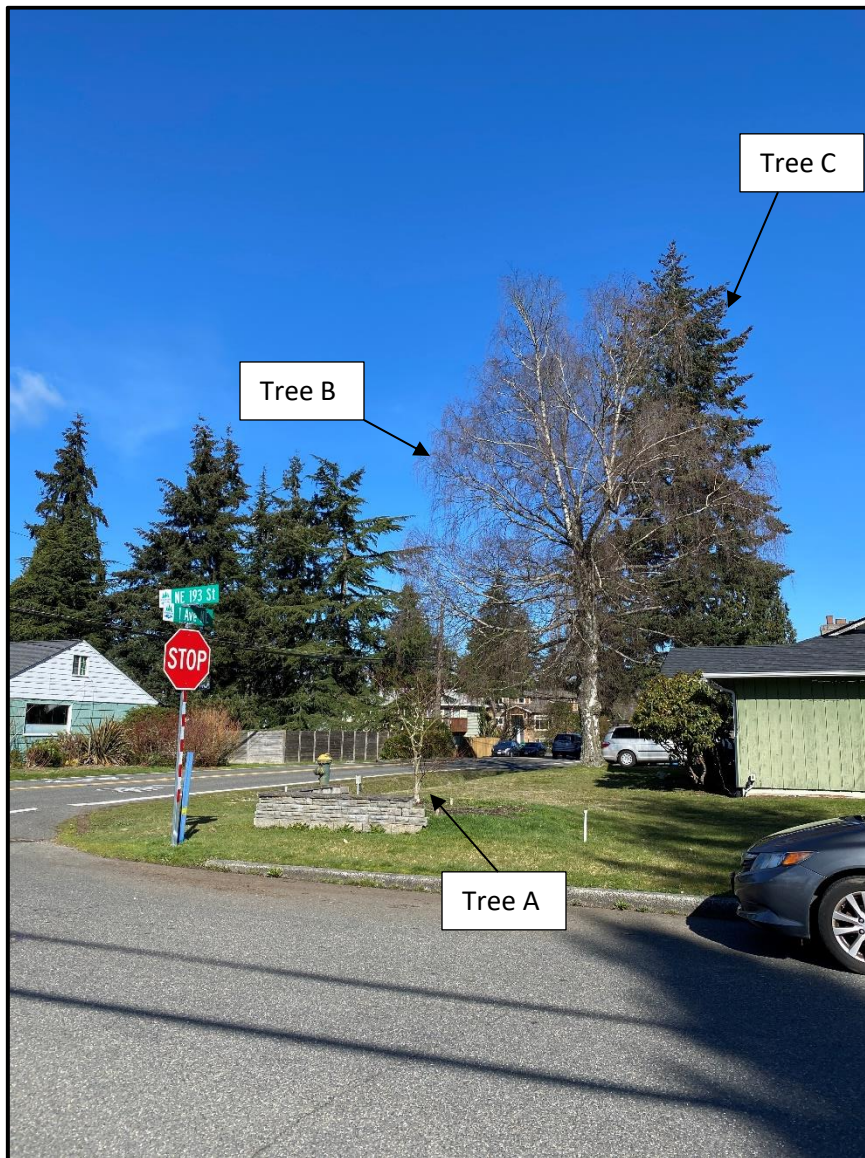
Off-site trees likely to be impacted by the sidewalk project looking northwest.
